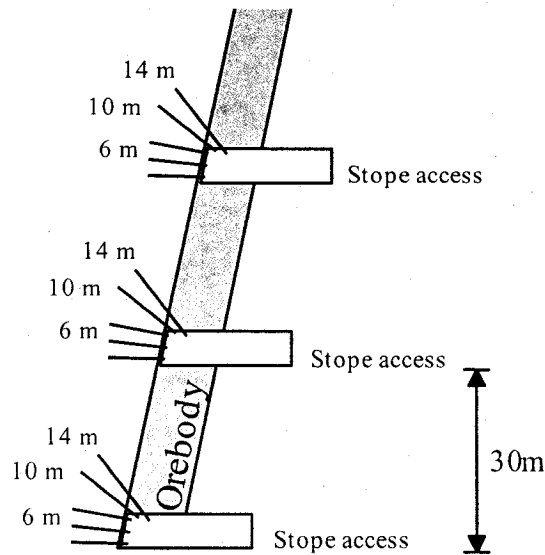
Stope sill cablebolt installation via stope sill, Zone 3-1
